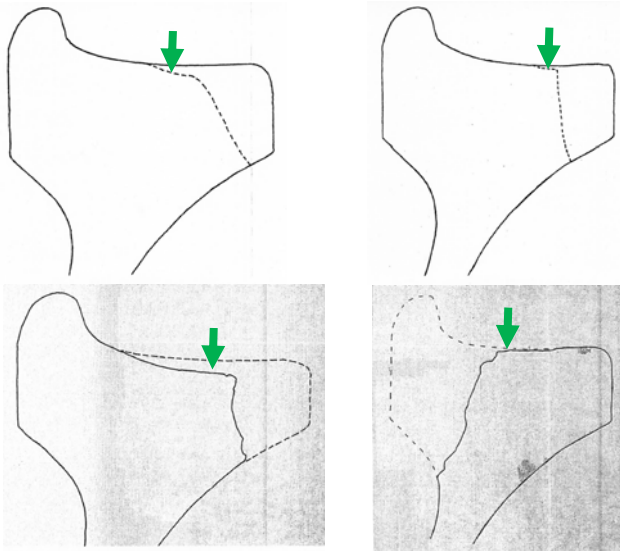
Branching between a Horizontal Subsurface Crack and a Vertical Crack
